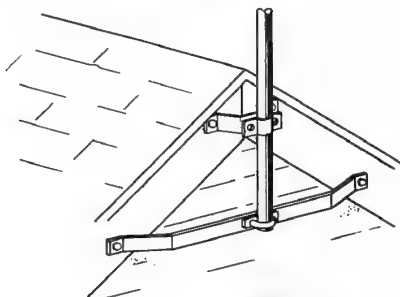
Wall mount to fit fascia at end of roof peak.
